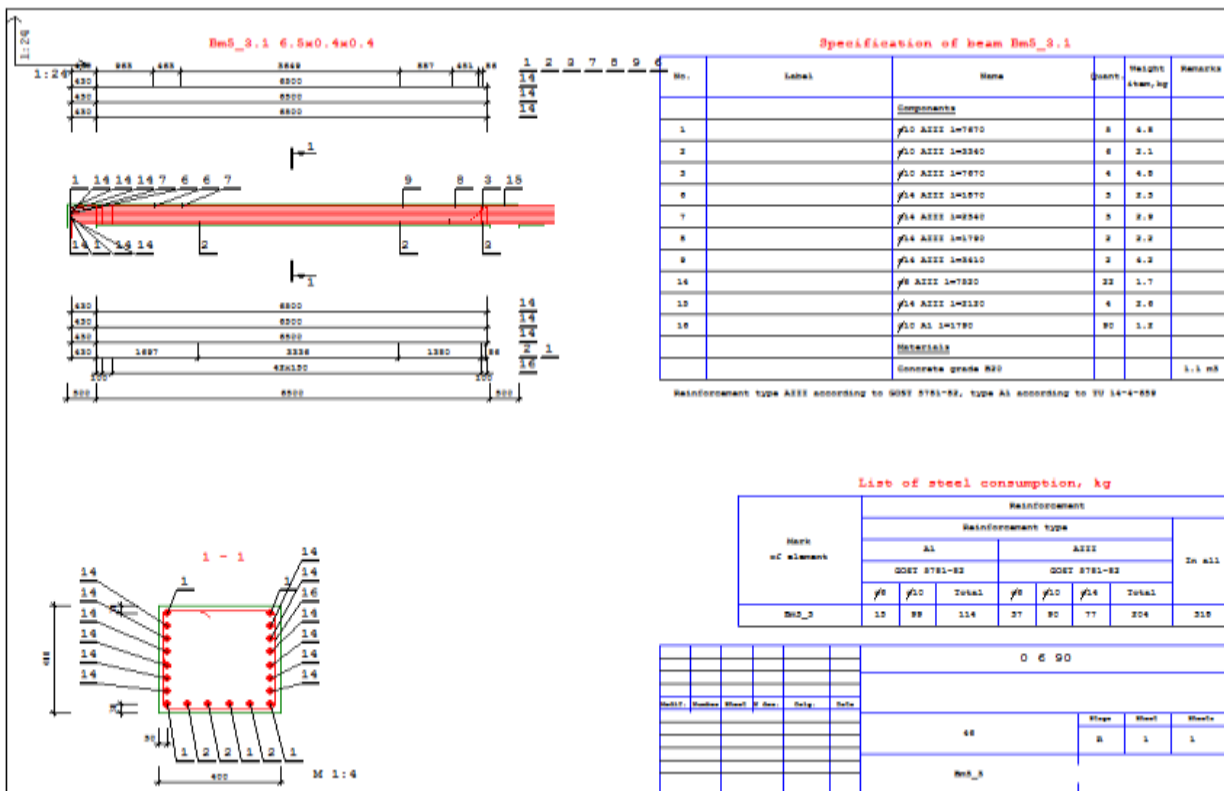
Variant of a building with a beam - slab floor. Beam B5-3. Working project drawings
